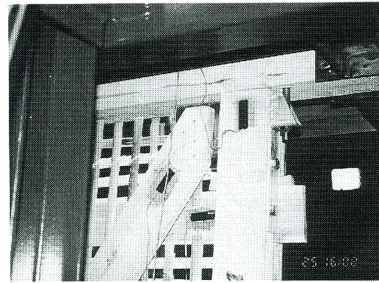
Joint of the brace is pulled at -1/30rad (No.5a)
